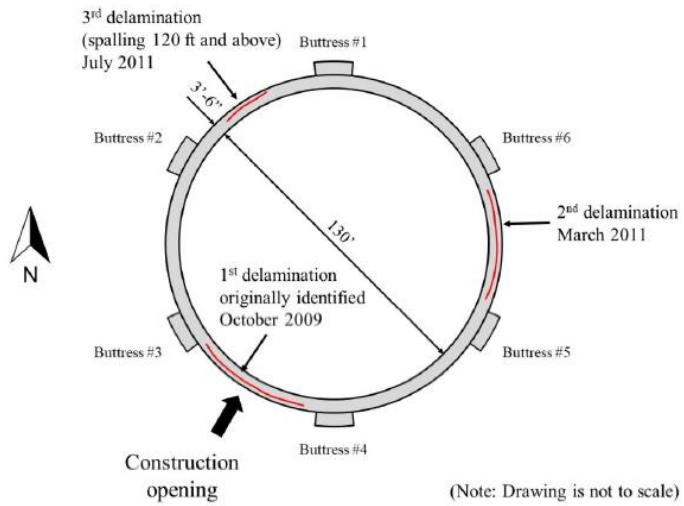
Location of the construction opening and wall delamination (Lehman et al. 2011)
